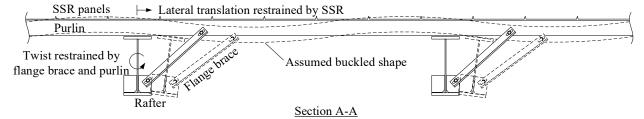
Section view of adjacent rafters braced by SSR and flange braces with assumed buckled shape
